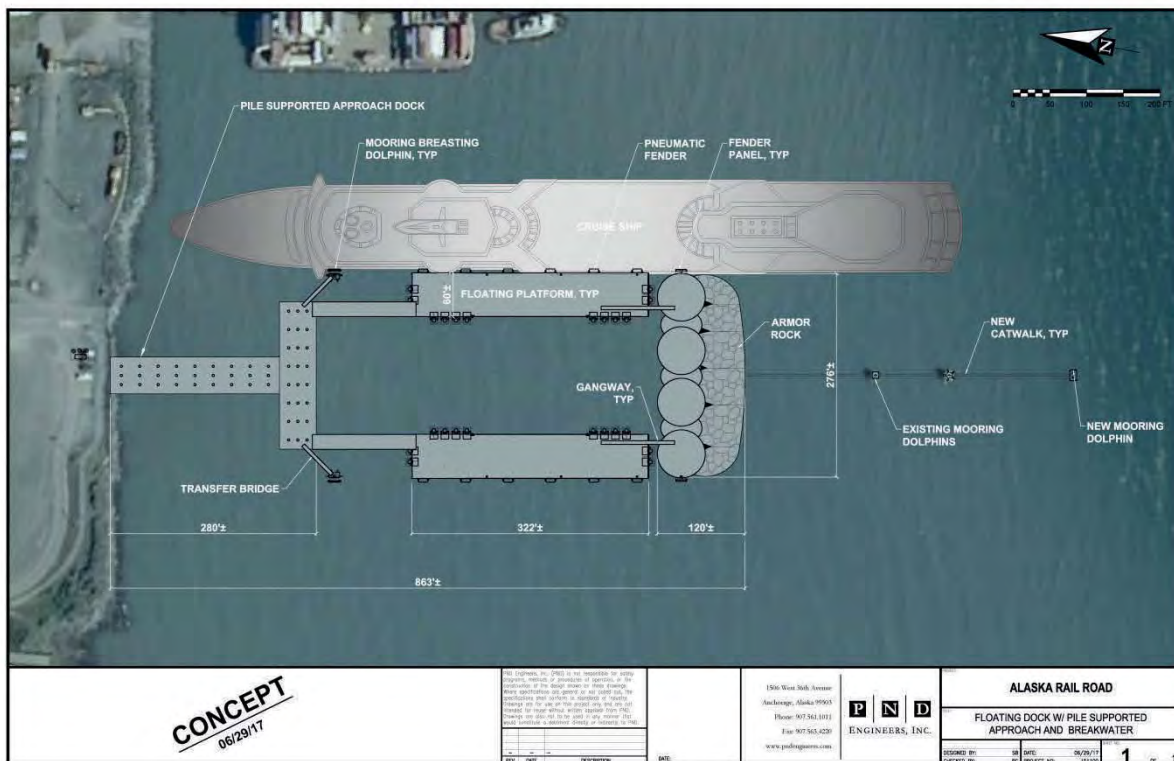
Option P-PD11: Pile Supported Dock with Floating Platforms and Armor Rock Head
